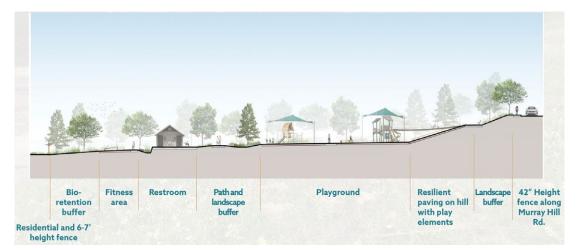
Section cut view from the west property line, across the playground to the east connection to Murray Hill Rd.
